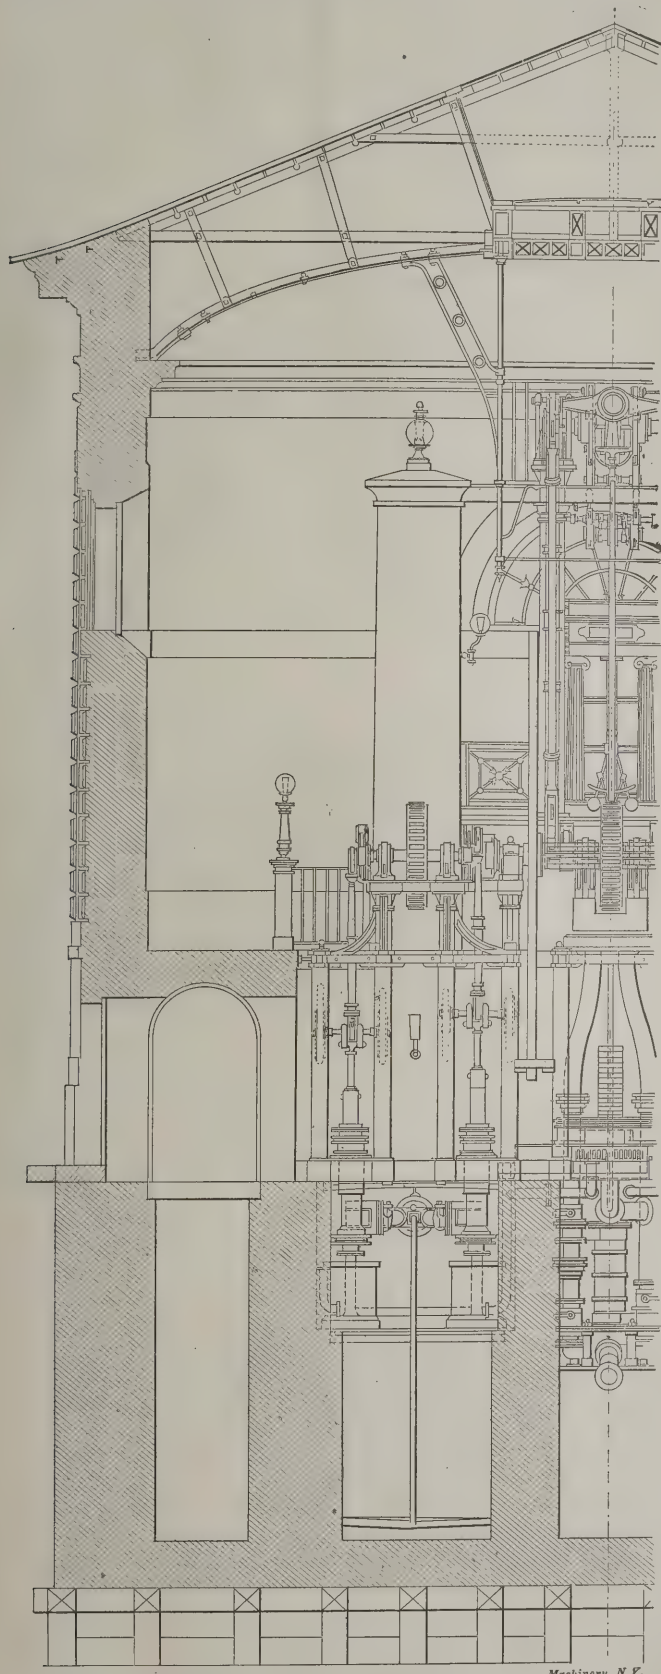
Details of Building and Arrangement of Pump Cylinders.
